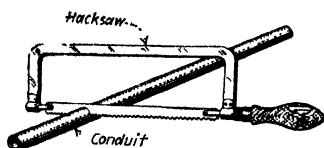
Cutting a piece of rigid conduit with a hacksaw.
